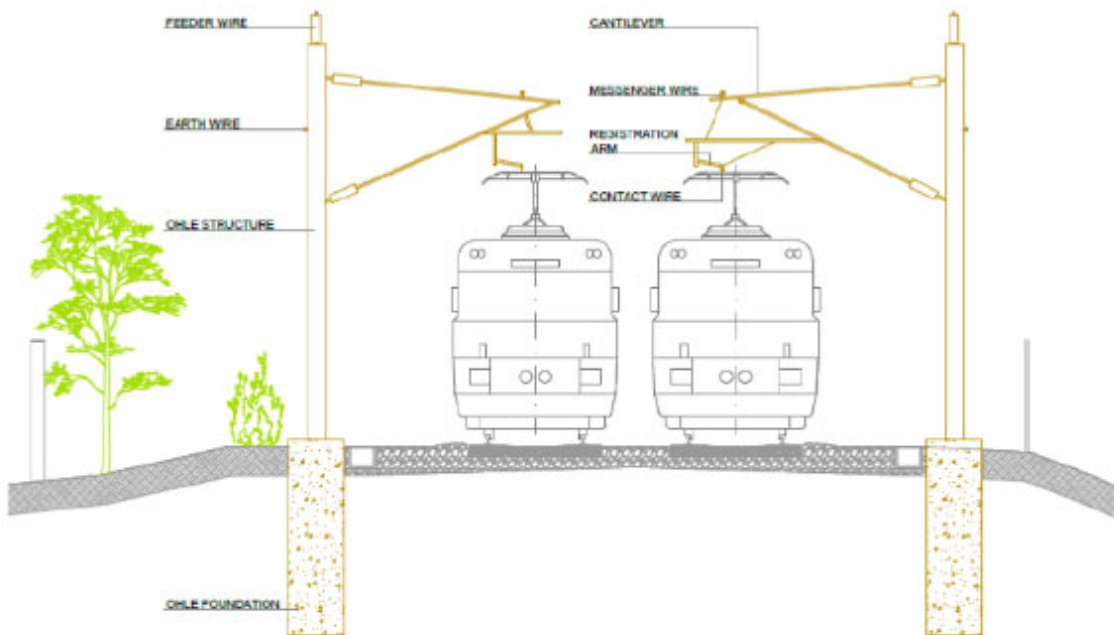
Typical OHLE STC in Two Track Open Route.
